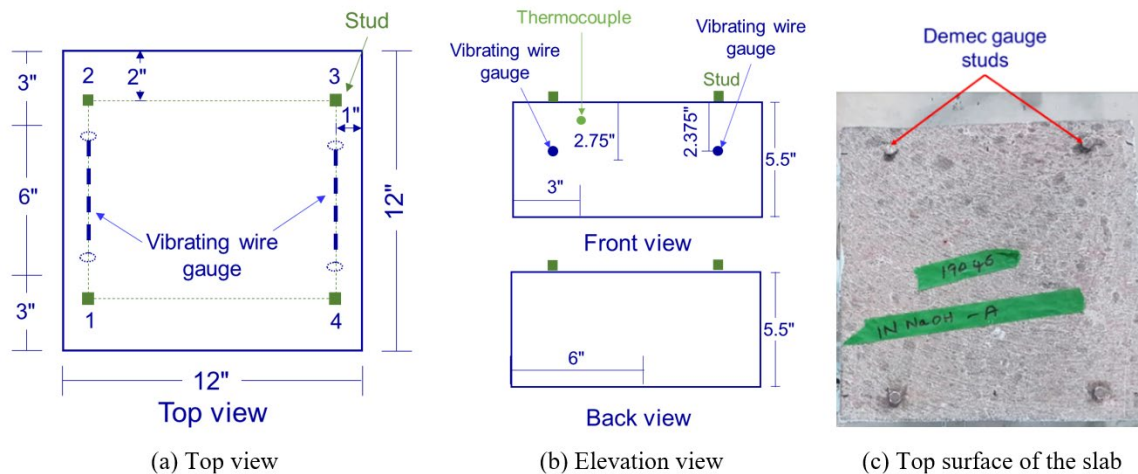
Instrumented slab for the evaluation of concrete expansion
